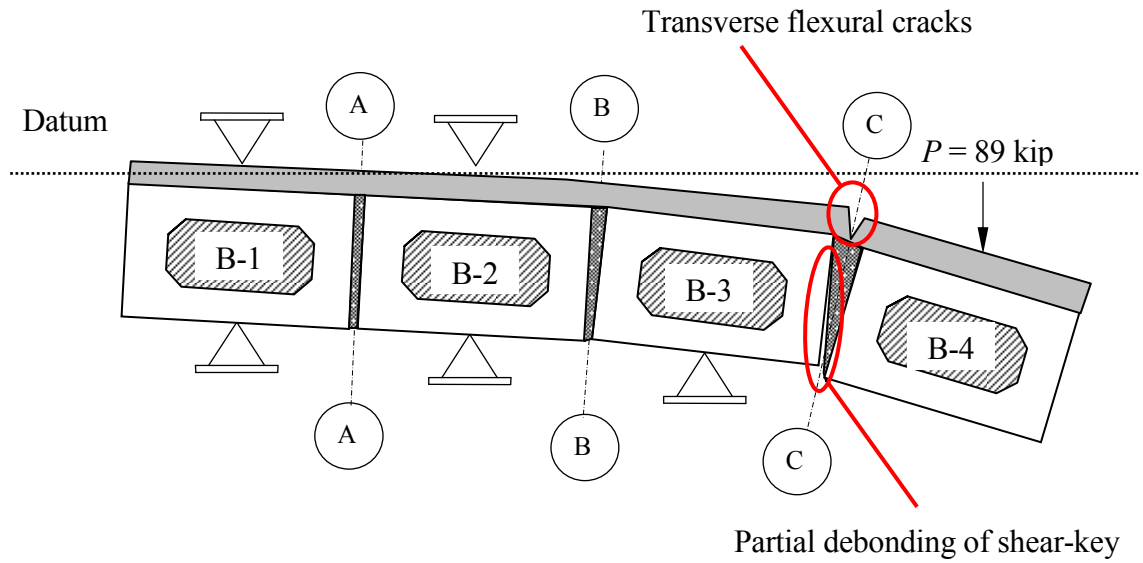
Bridge deformed shape due to applying vertical load at beam B-4.
